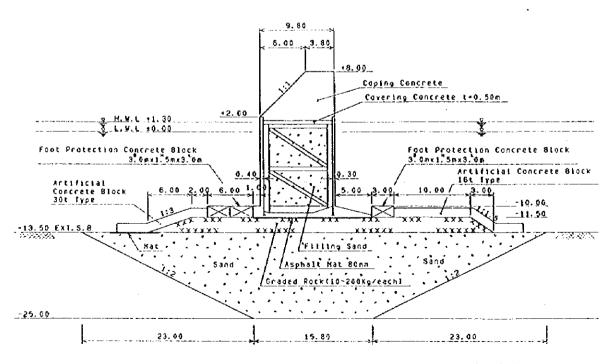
(2) Typical Cross Section of Breakwater (Hybrid Caisson)
